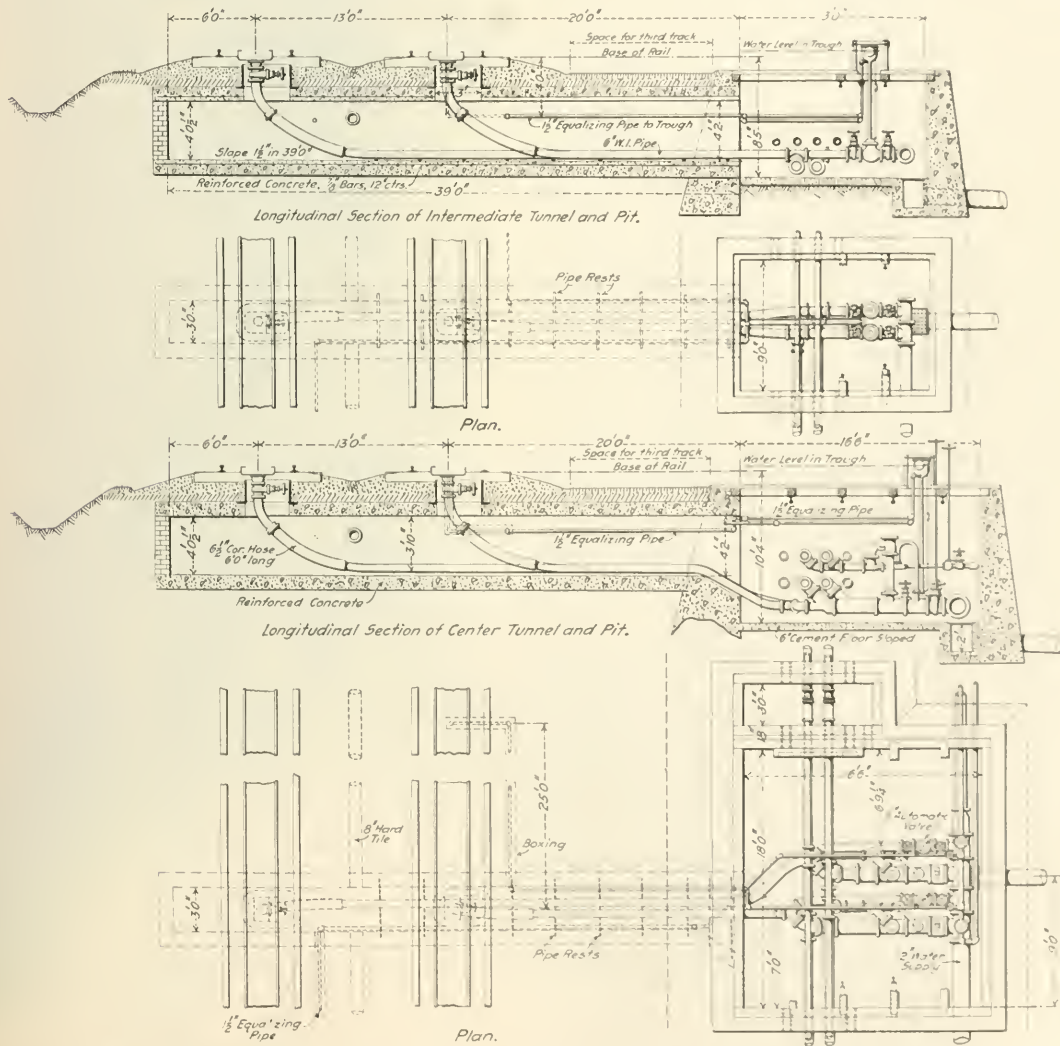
Details of Water Supply Tunnels and Manholes for Two-Pipe Circulation System to Track Tanks.
